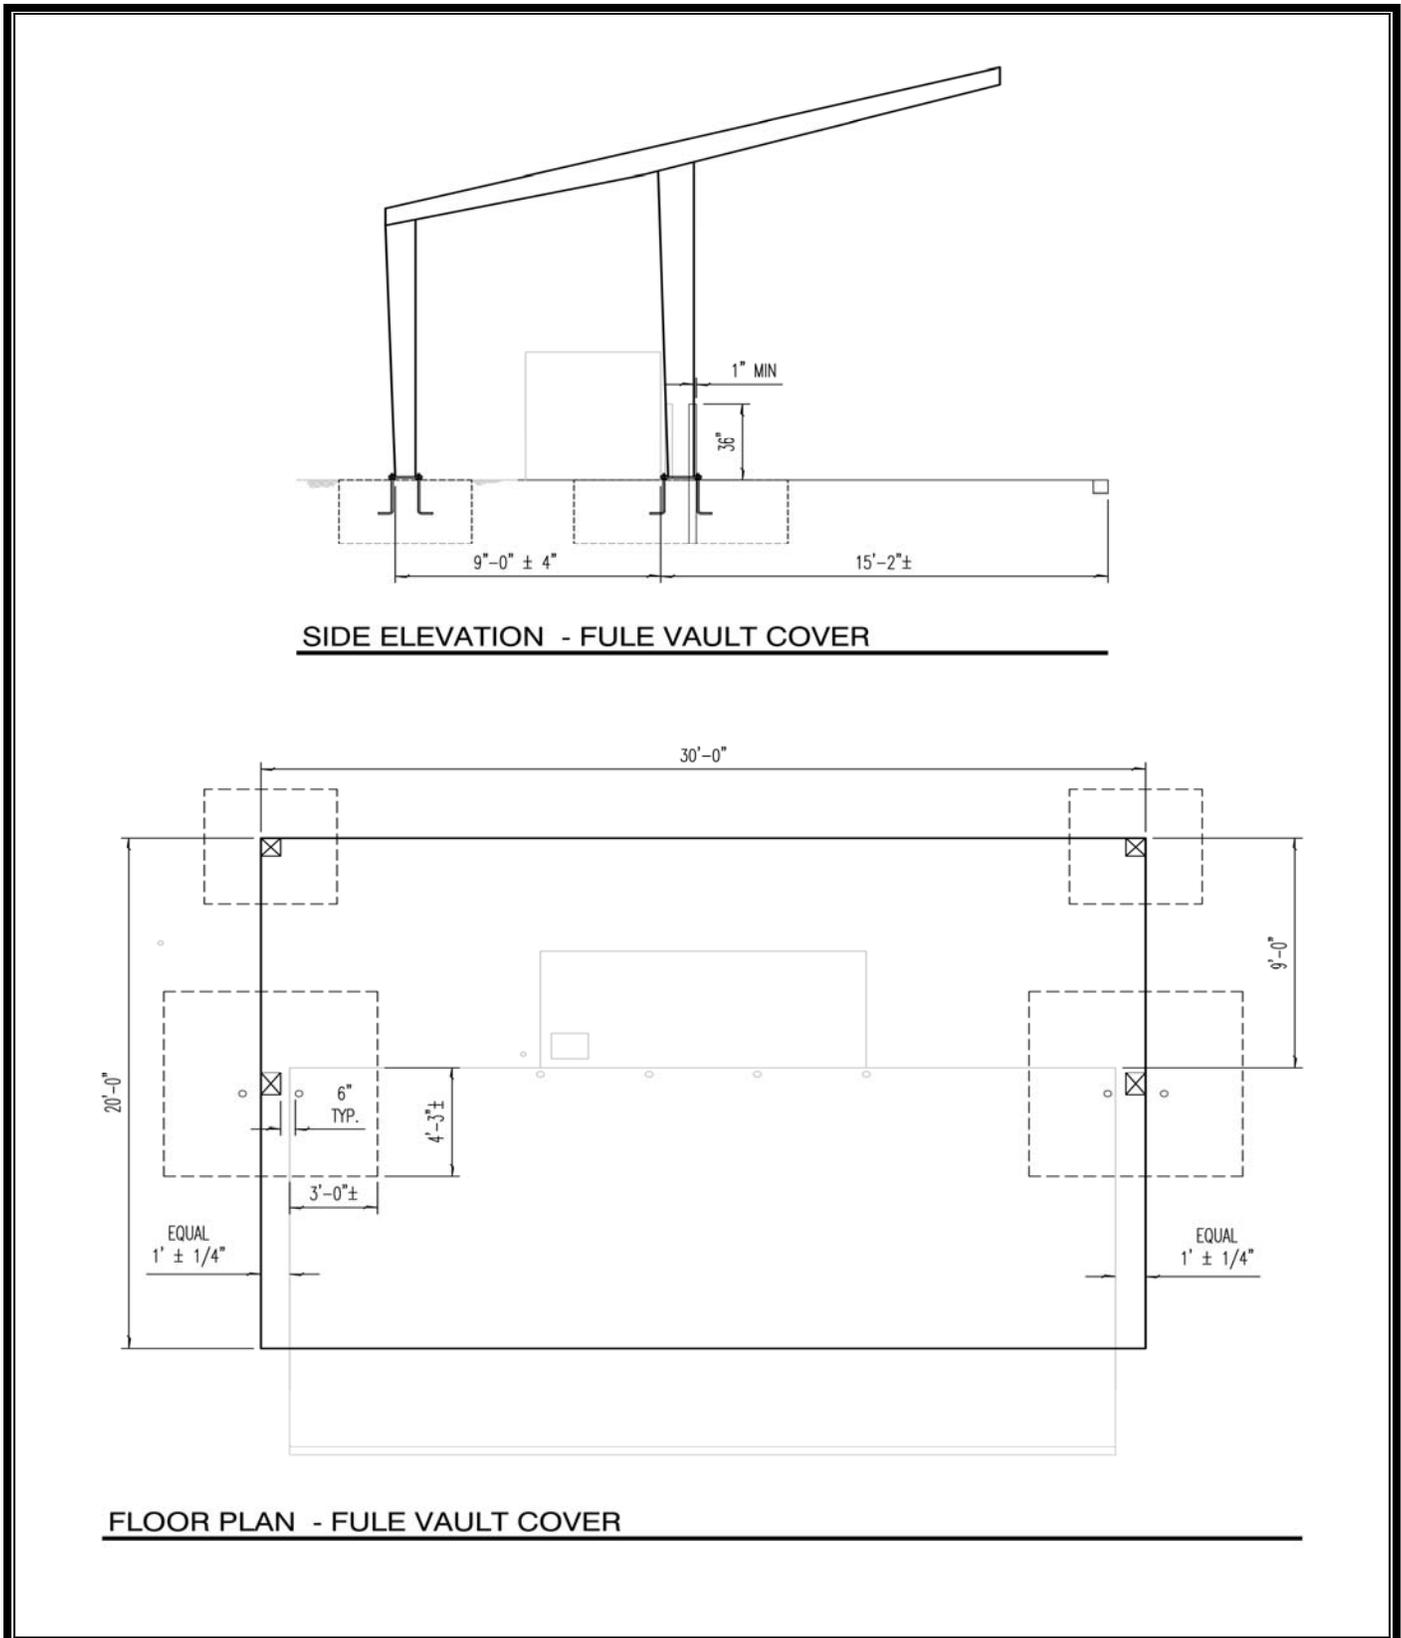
Schematic (pending final design) – New fuel vault and canopy to be constructed.
